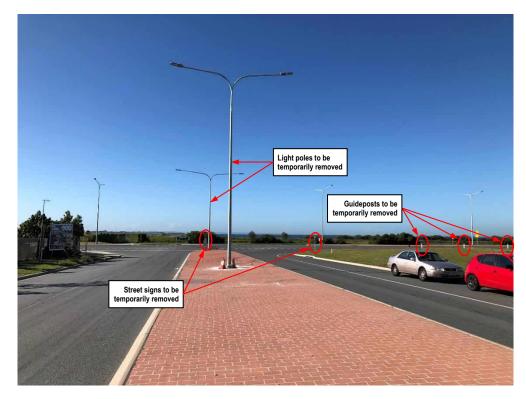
Bishop Drive / Lucinda Drive Intersection (Location 1) Looking East
